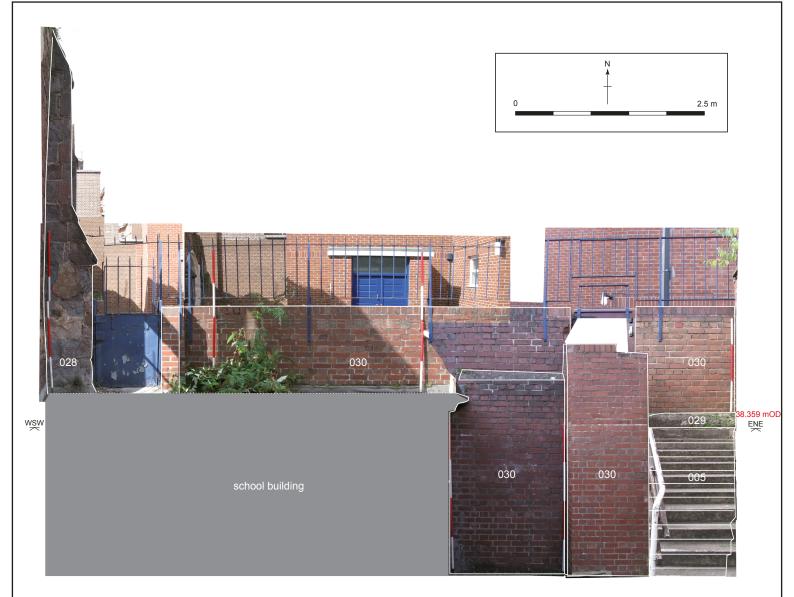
Kalendar Hall, Cathedral School, Exeter: Elevation 2-North
